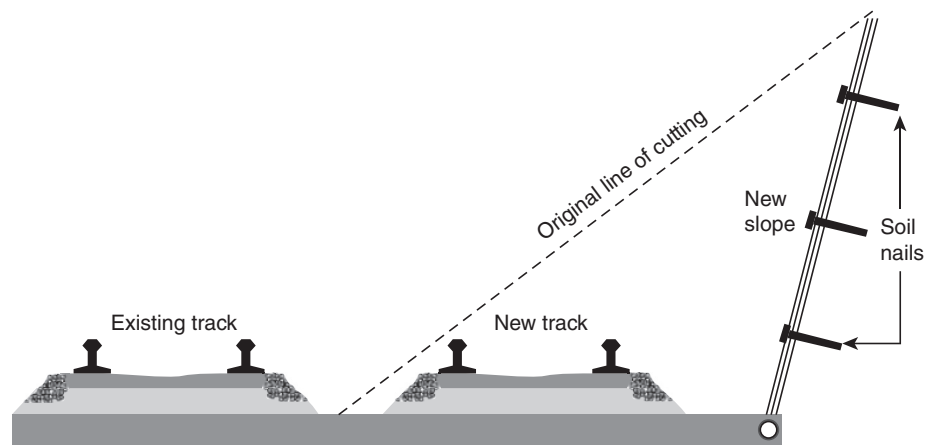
Soil nailing for additional railway track. (After Prashant and Mukharjee, 2010)
